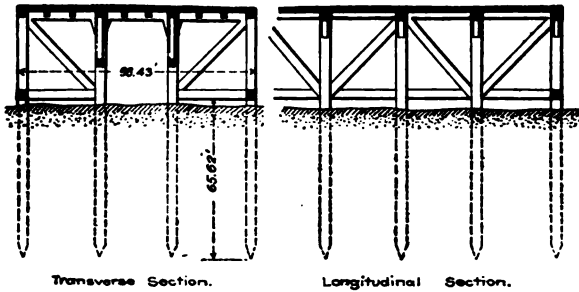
Sections of Ocean Pier at Southampton, England.
